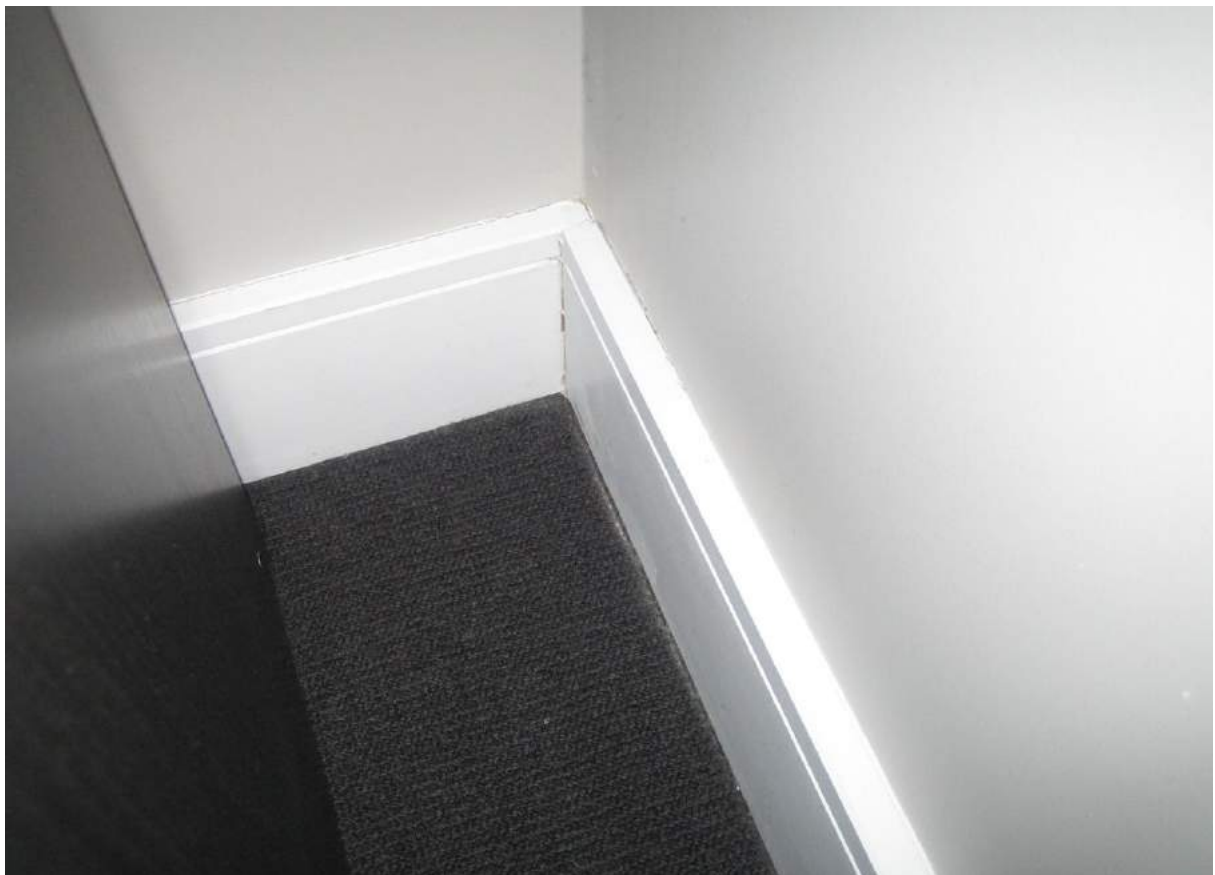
Water damage to skirting in the S/E corner of bedroom 1 to Unit 101.
